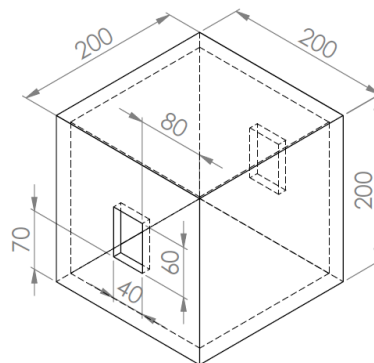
Schematic view of the studied building model with dimensions provided in mm
